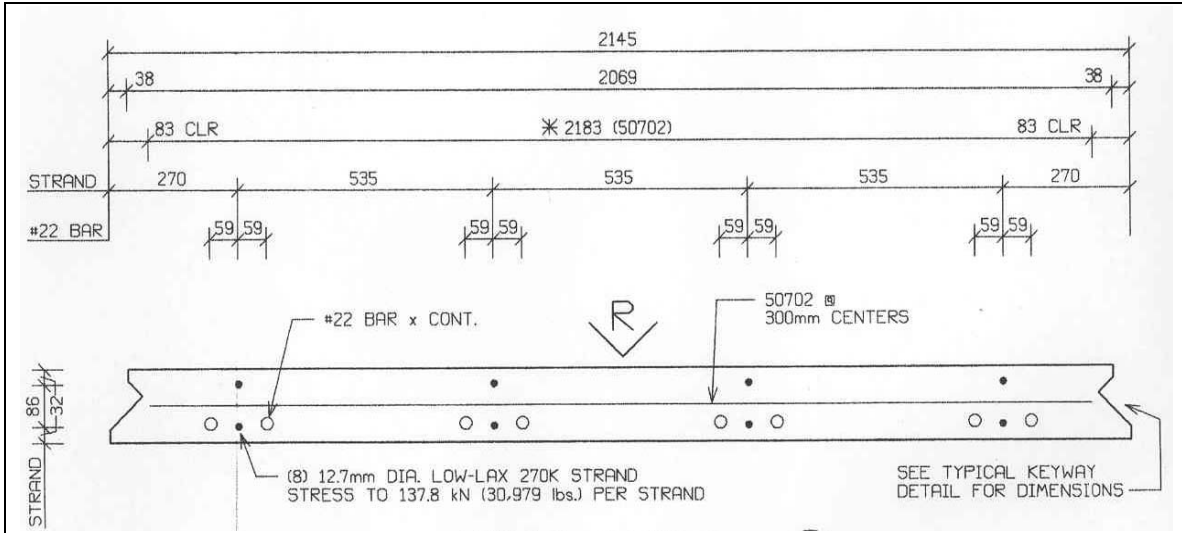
Typical NU-Deck panel cross section (NDOR, 2003)
